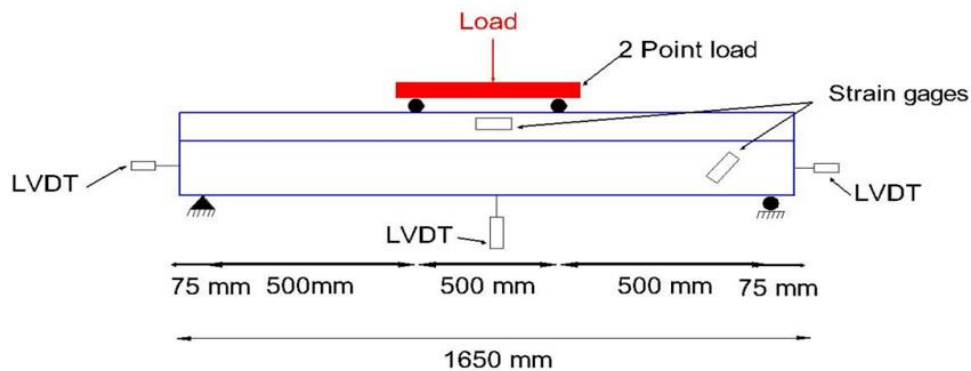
Illustration of the dimensions and details of the T-beam specimens
